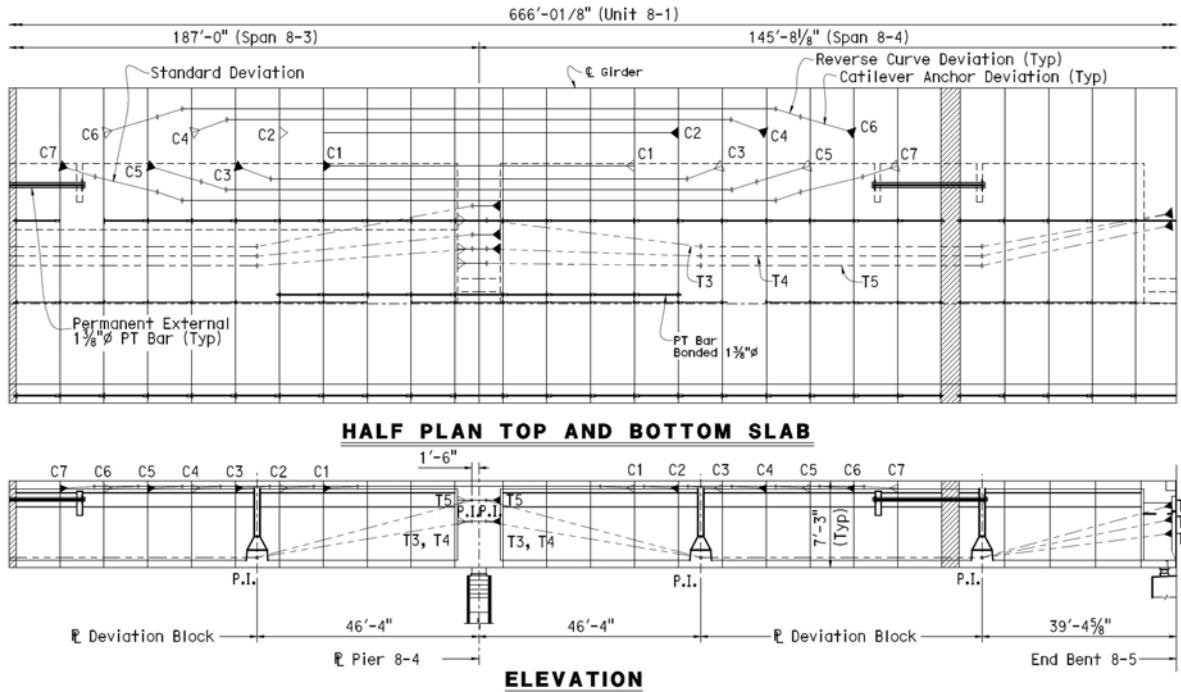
Tendon Layout for the Precast Segmental Cantilever Bridge Design Example
